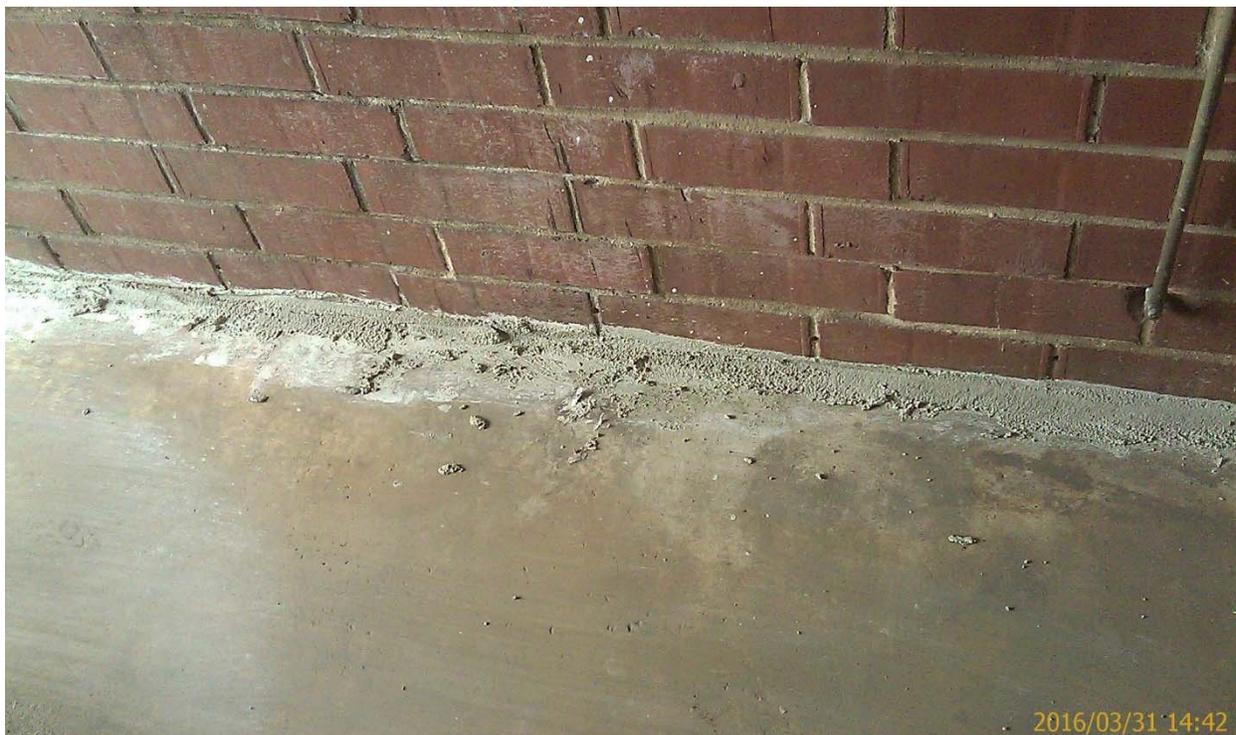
Repaired gap between floor slab and eastern wall of Leather Trimmings building.
